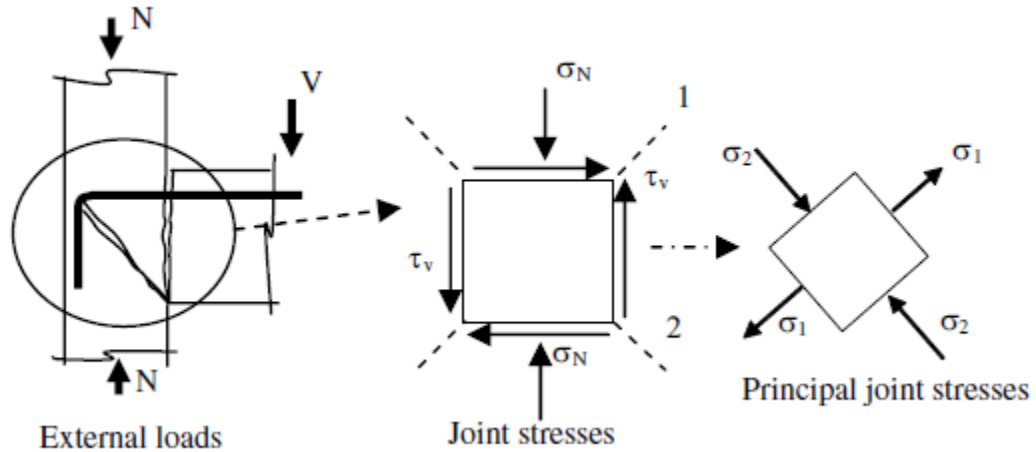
BCJ external loads, stresses in the joint intersection, and principal joint intersection stresses [35]
